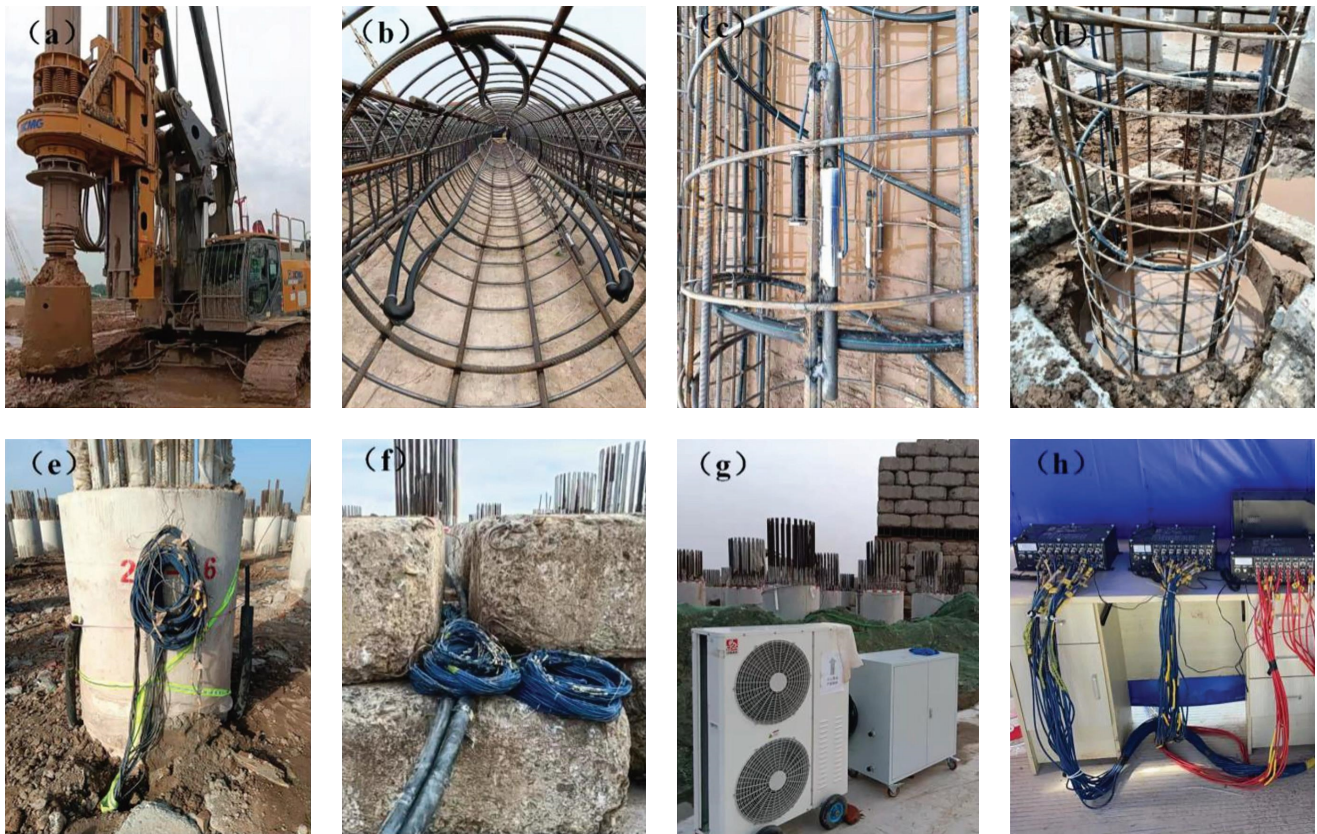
Construction of energy pile on site: (a) borehole drilling; (b) reinforcing cage with 3U-shaped tube; (c) sensor instrumentation; (d) burying of reinforcing cage; (e) pile after cast-in-place concrete ready for test; (f) stacking of concrete blocks for static load test; (g) applied apparatus for thermal response test; (h) data measurement of strains and temperatures.
